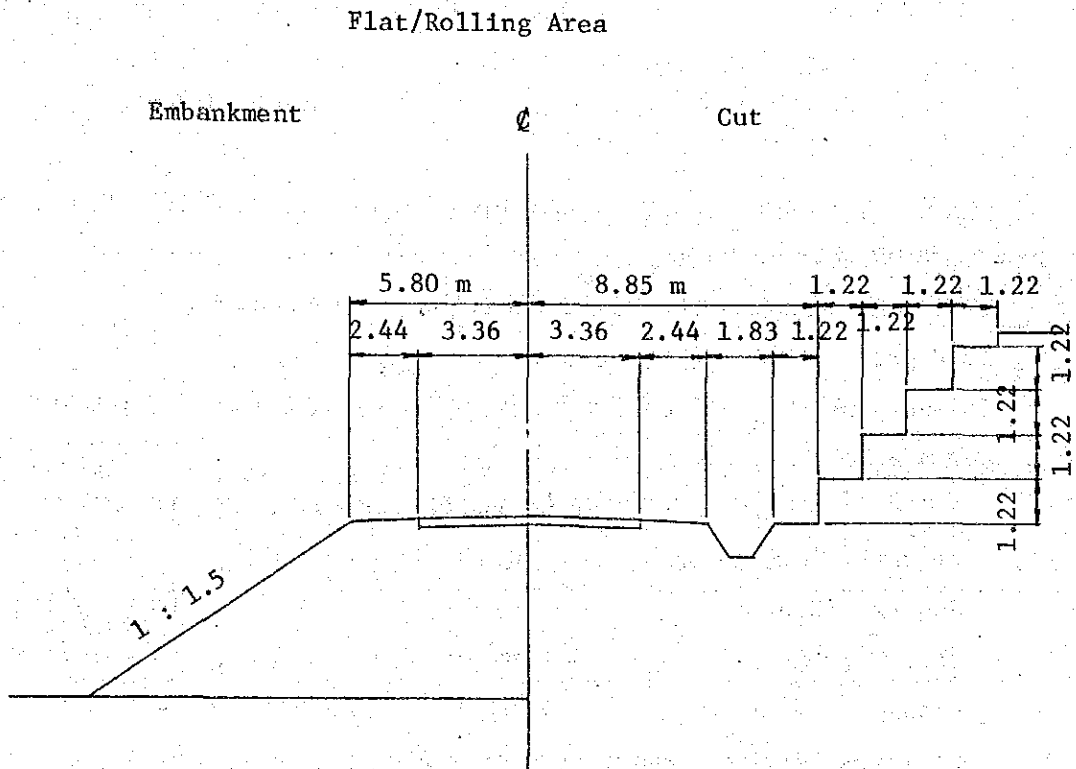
TYPICAL CROSS-SECTION BY PENINSULAR STANDARD
